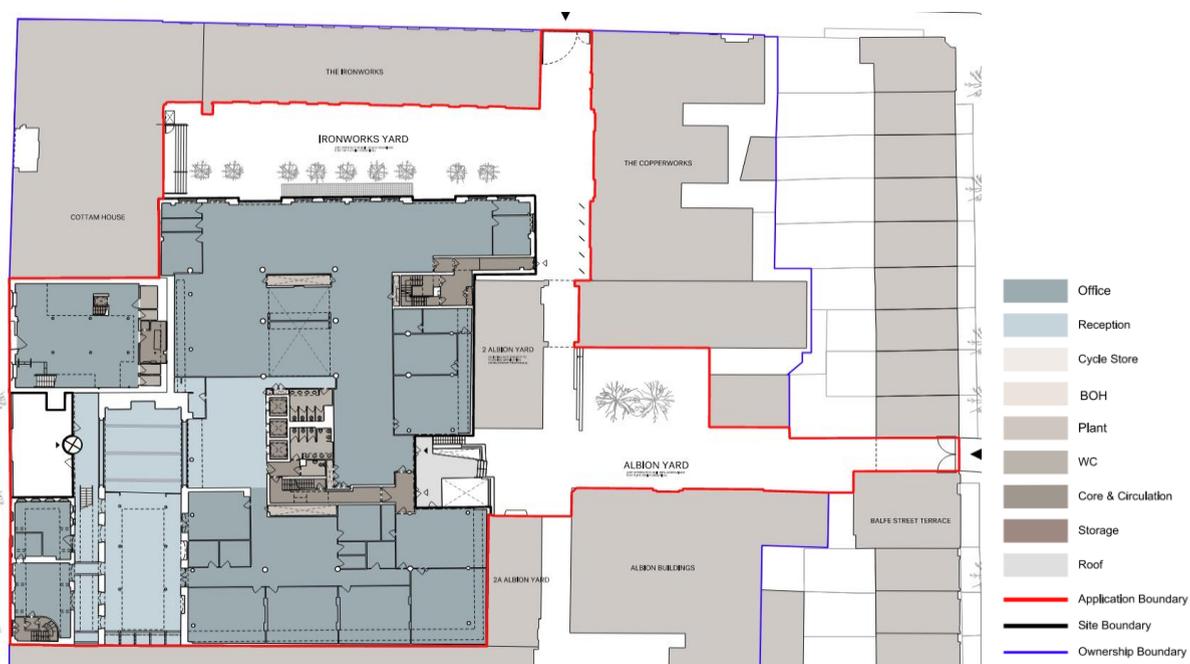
Existing Ground Floor Layout and Office uses – 34 York Way, Jahn Court and 34b York Way
